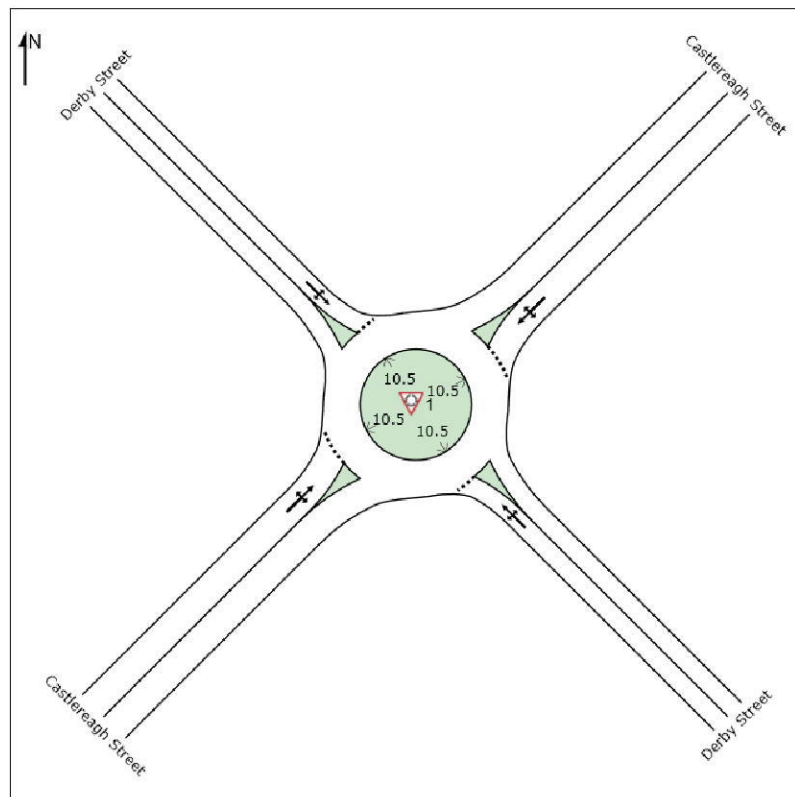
Roundabout intersection of Castlereagh Street with Derby Street (SIDRA)
